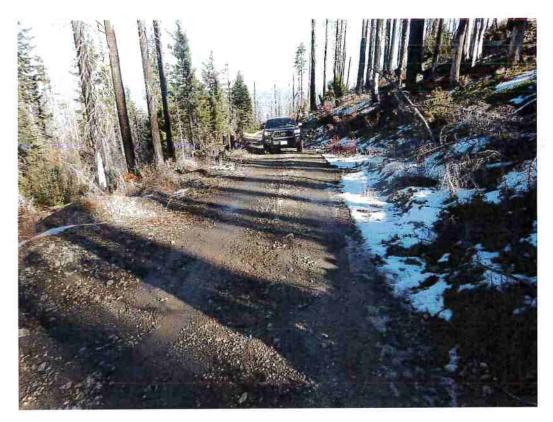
RP 12. Vehicle traveling south-west, photo taken facing north-east.
